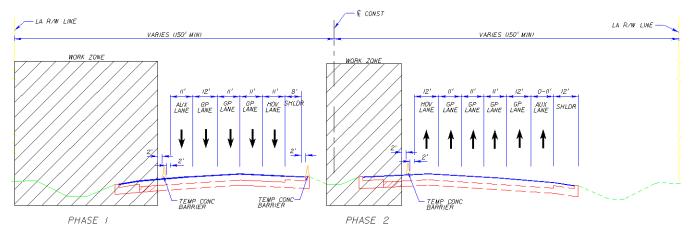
Traffic Control Plan Segment 3 from South of the Park & Ride to North of the Park and Ride
